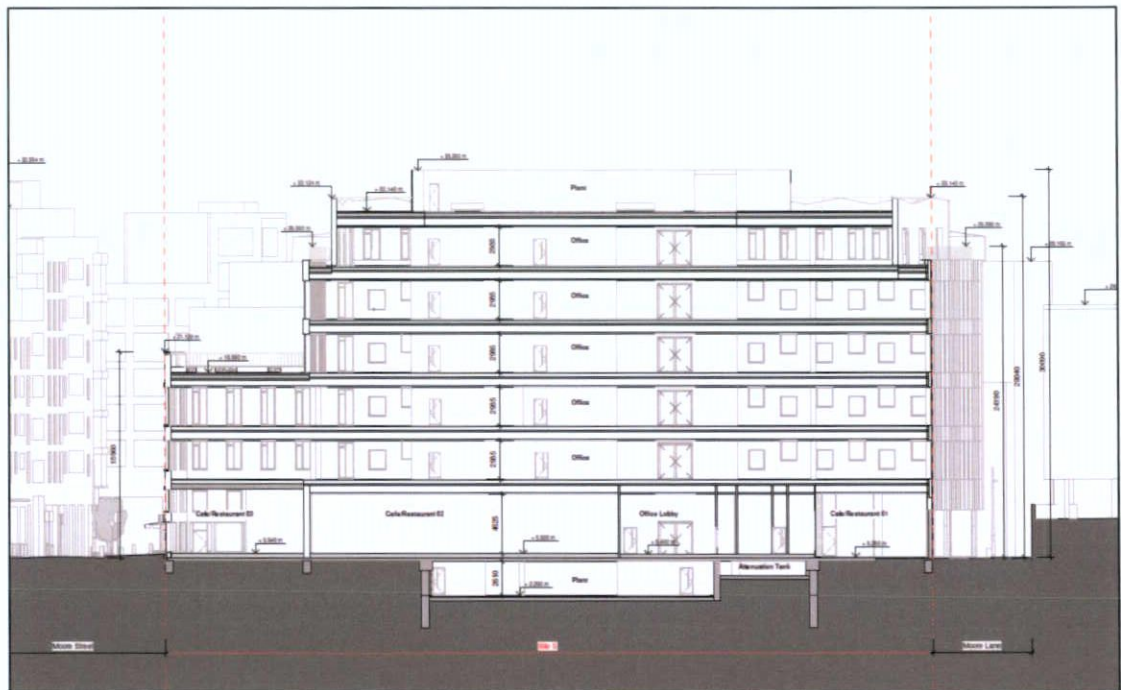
Cross section through Site 5 from Moore Street to the west to Moore Lane to the east.
